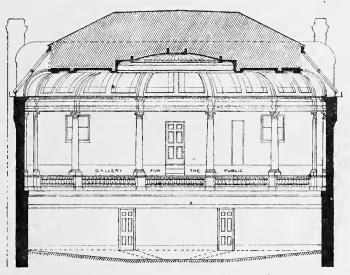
SECTION ON CD. Seale of about 15 feet to one inch.
